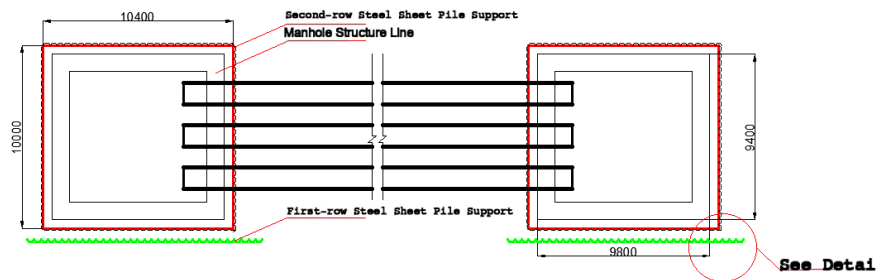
Plan view of the inspection well support at the bridge abutment of the bridge.
